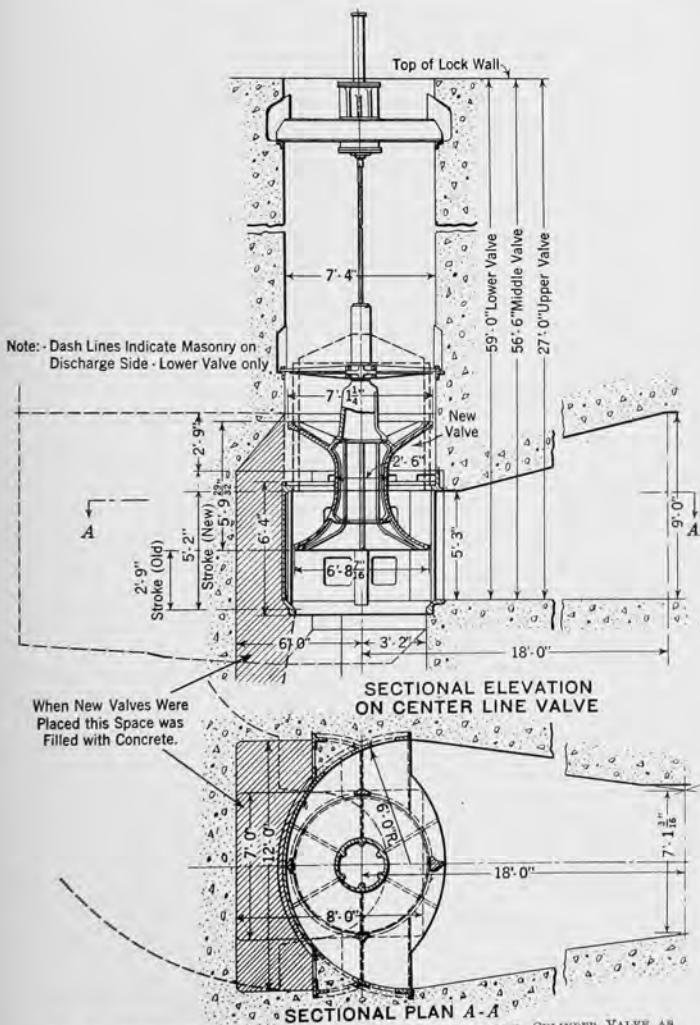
TENNESSEE RIVER, WILSON LOCK: GENERAL ASSEMBLY, CYLINDER VALVE AS ORIGINALLY DESIGNED AND INSTALLED.
